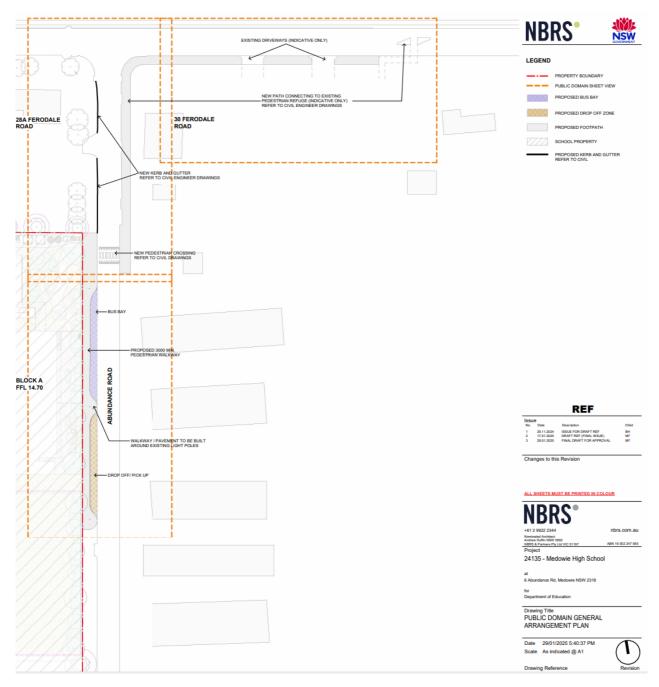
Extract of Public Domain Plan works – Abundance Road (Source: NBRS)
